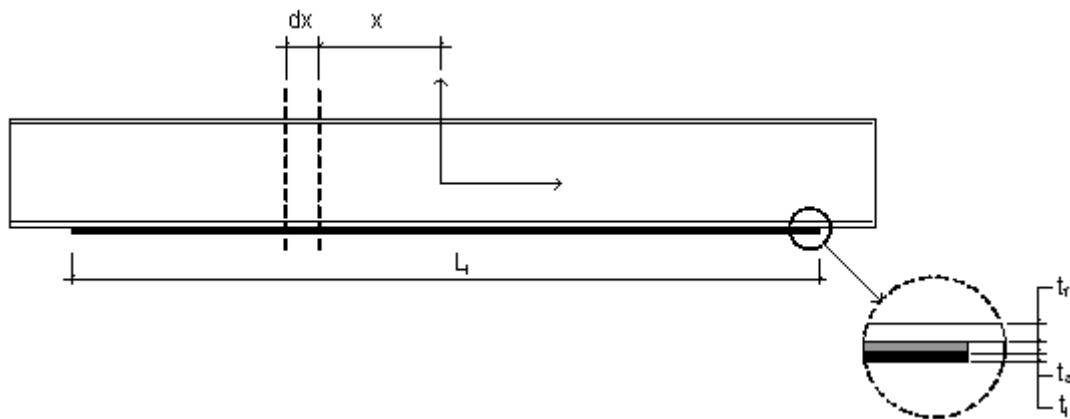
Steel beam strengthened with bonded prestressed laminate
